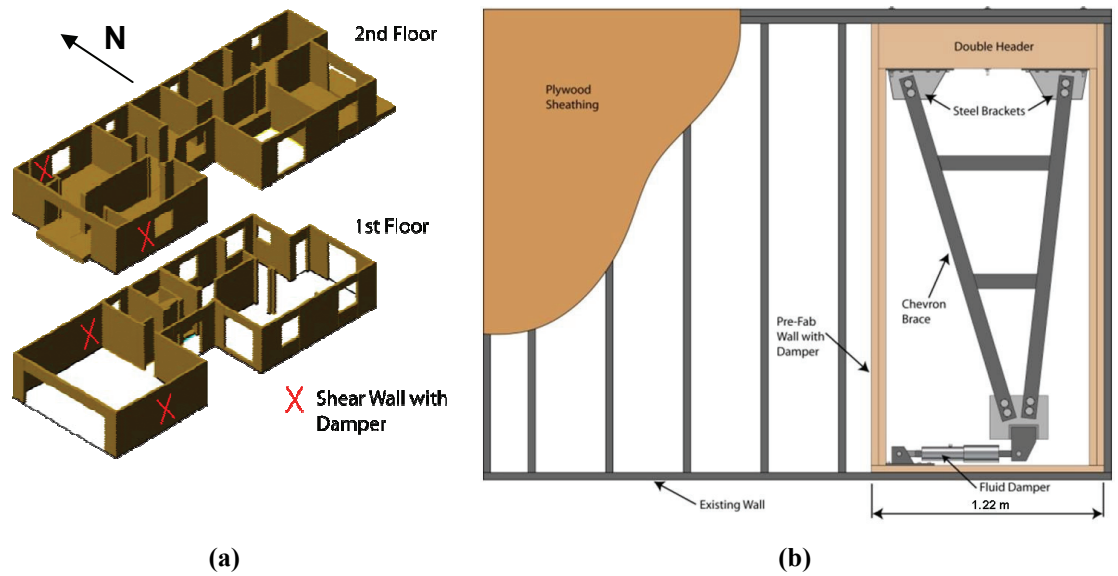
(a) Isometric View of First and Second Floor Levels showing Location of Dampers and b) Schematic of Typical Shear Wall Retrofitted with Modular Damper Wall Unit
